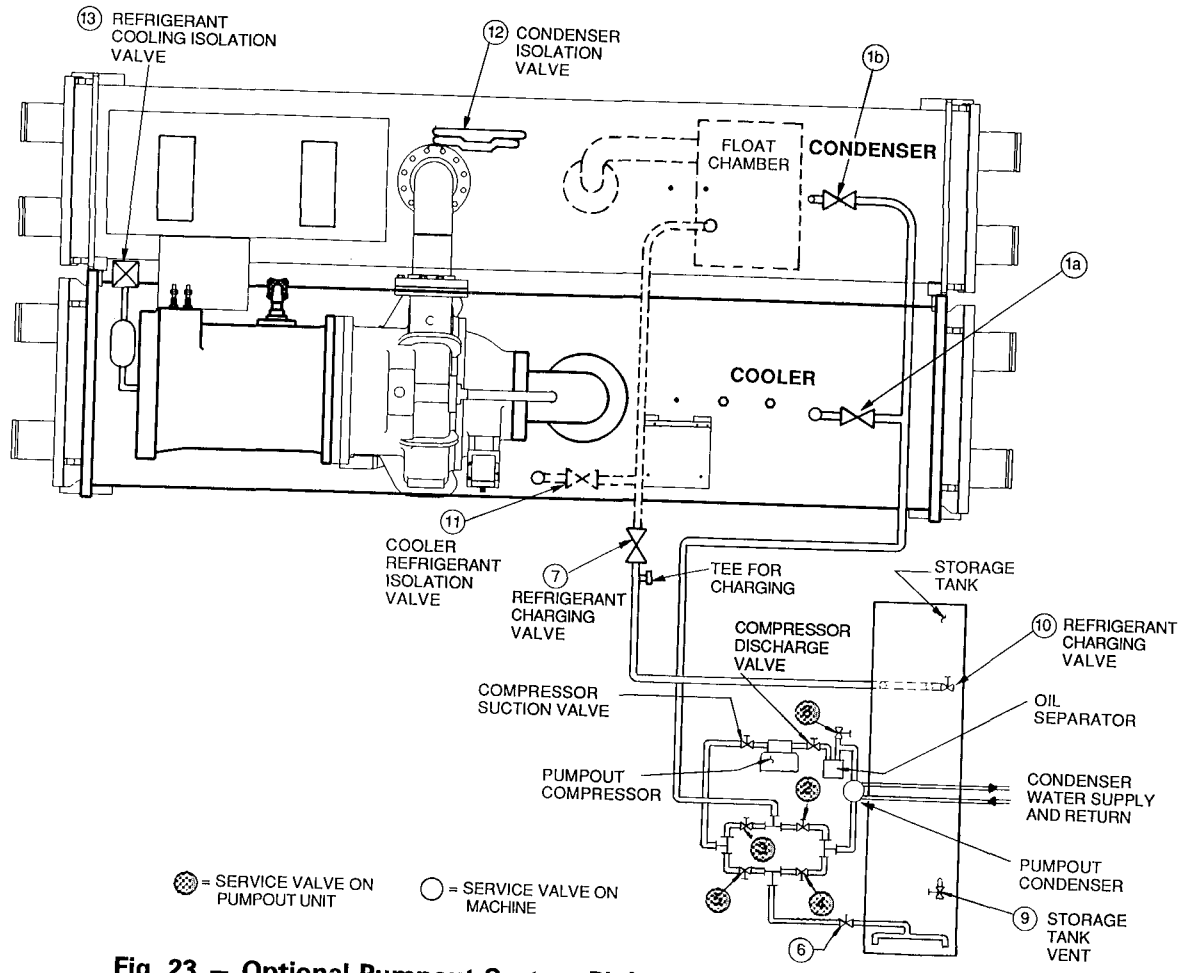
Optional Pumpout System Piping Schematic with Storage Tank
